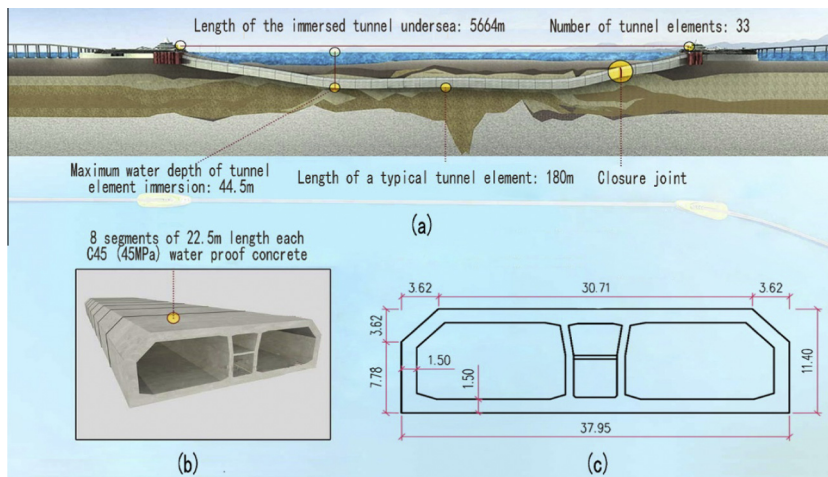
Tunnel between the West Artificial Island and the East Artificial Island (see Fig. 6). Tunnel: (a) longitudinal section, (b) typical tunnel element, (c) cross-section of a tunnel element.
